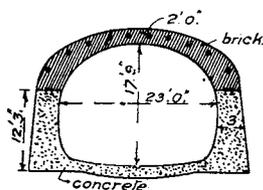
UNDERGROUND RAILWAY, BOSTON, U.S.A. Section of Tremont Street Tunnel.
